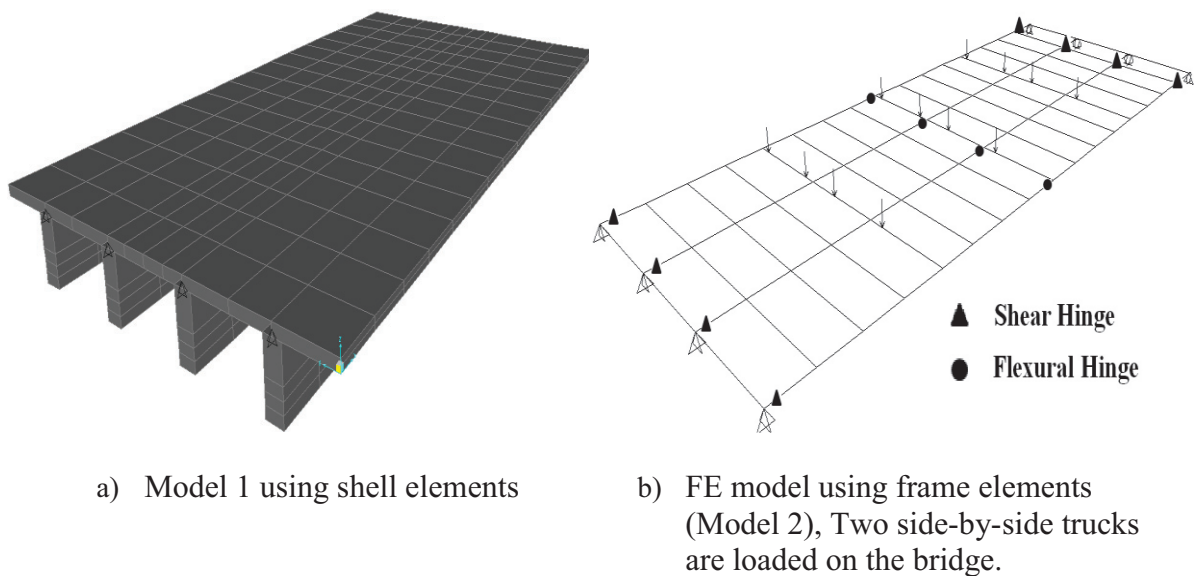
Finite Element Models for Conventional Steel-Reinforced Concrete Decks
